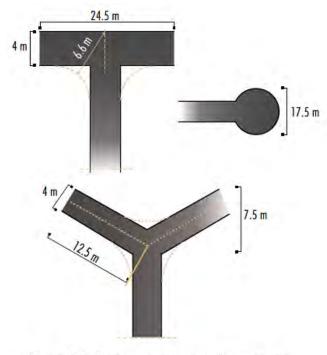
Design requirements for a private driveway longer than 50 metres Turning areas should allow type 3.4 fire appliances to turn safely.
